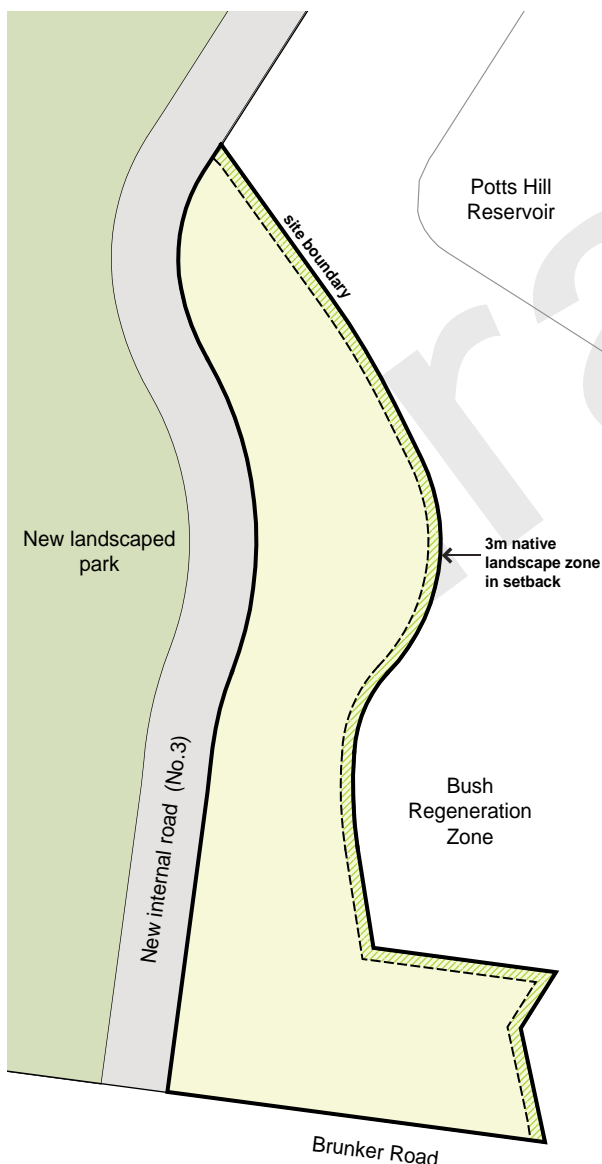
Built Form Control Plan - Brunker Road Apartments
